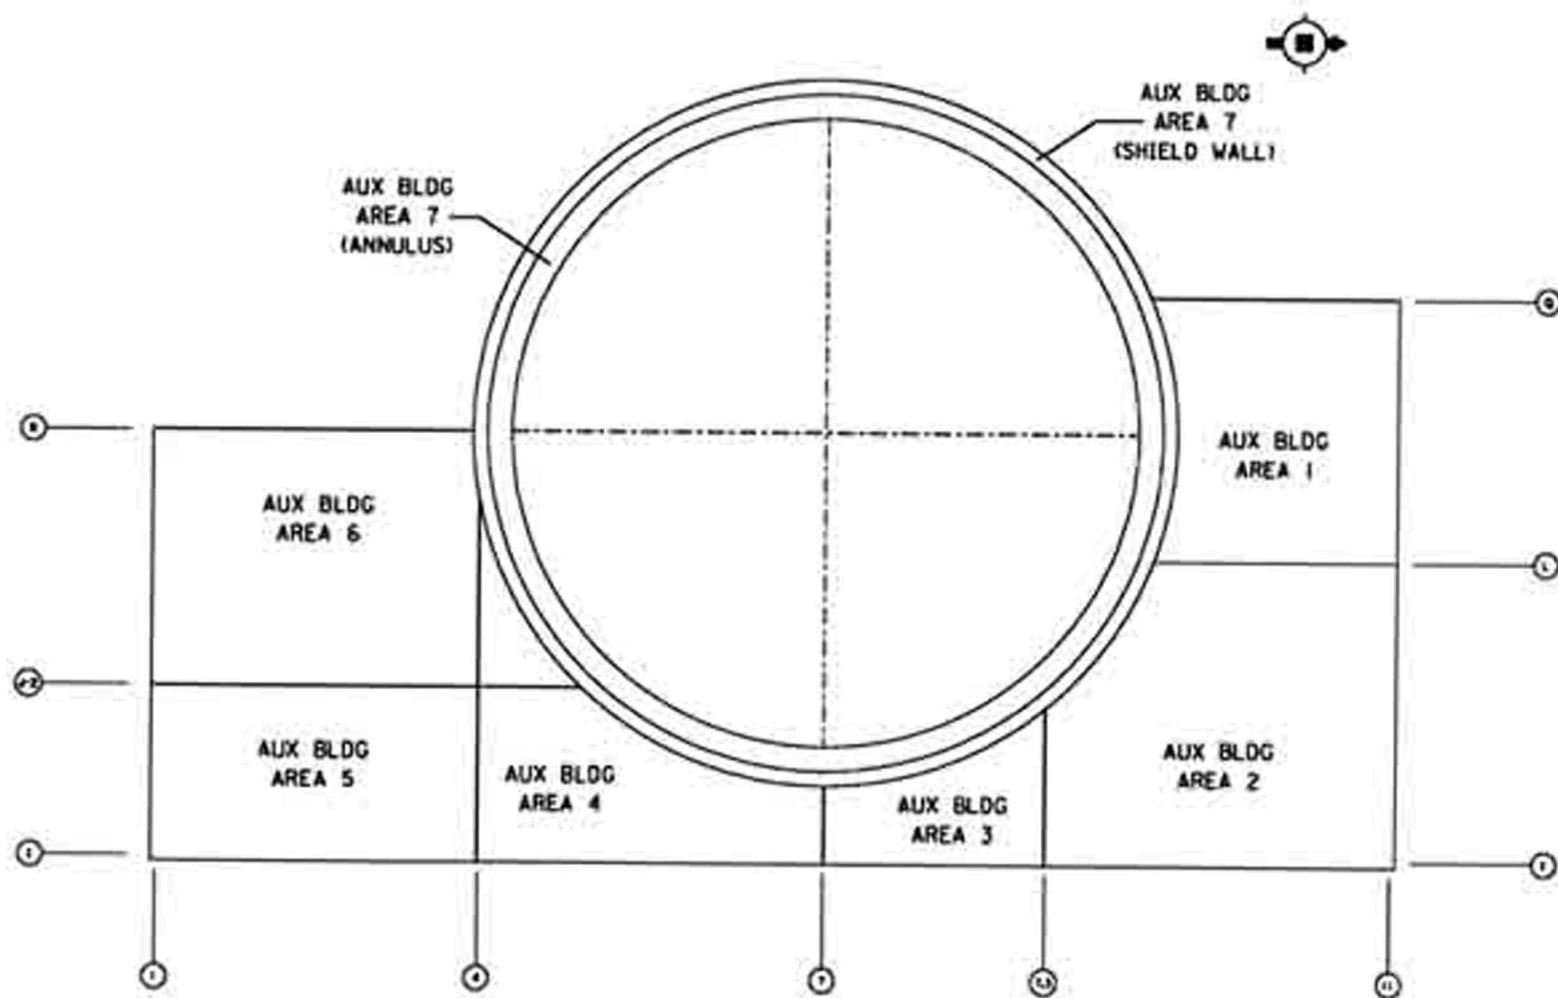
H.2-1 [General Layout of Auxiliary Building]
